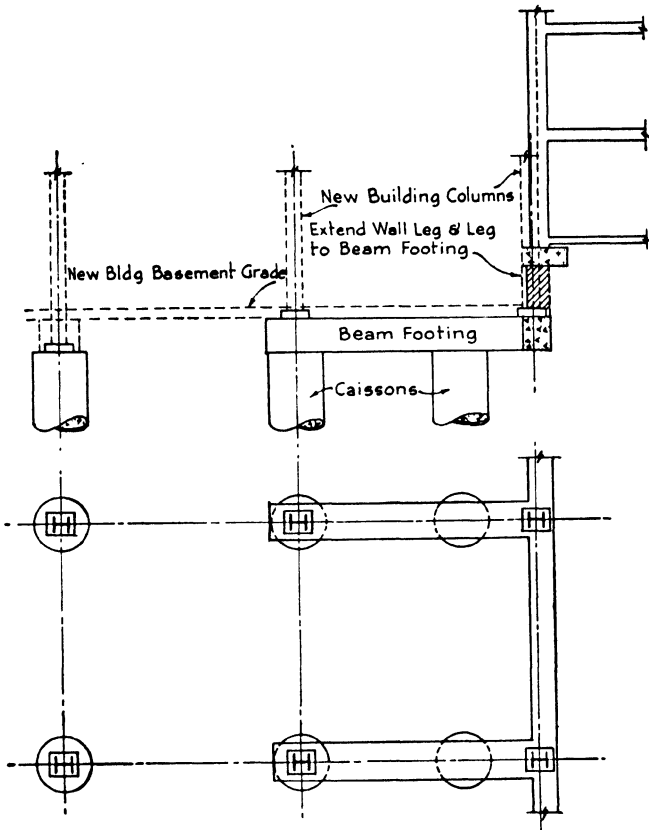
Picking Up Old Wall with Cantilever Beam Footings.
